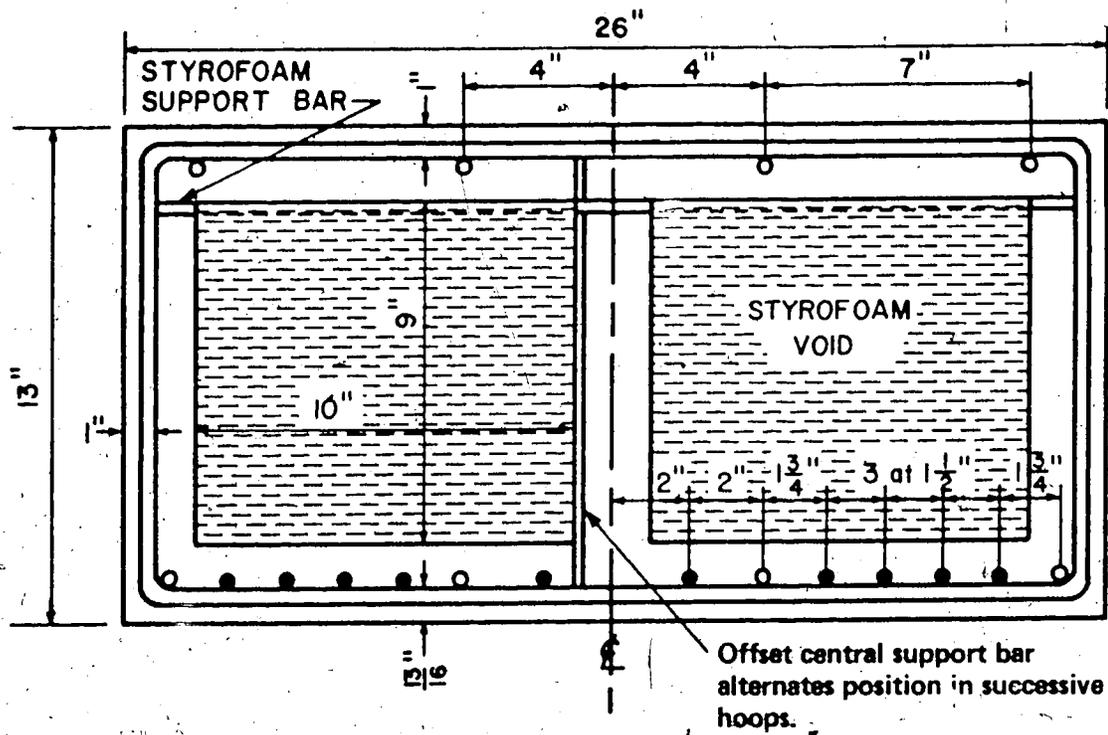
(A) RECTANGULAR BEAM CROSS-SECTION
